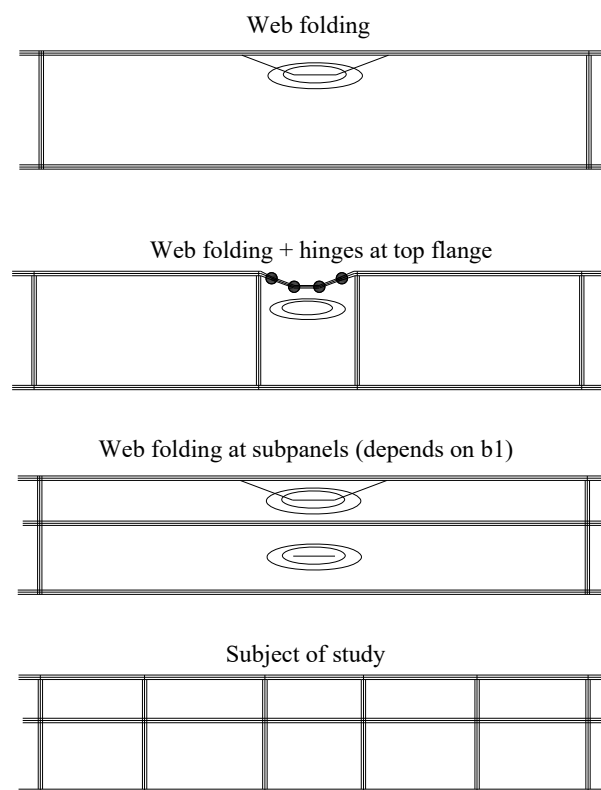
Typical failure modes in stiffened and unstiffened girders
